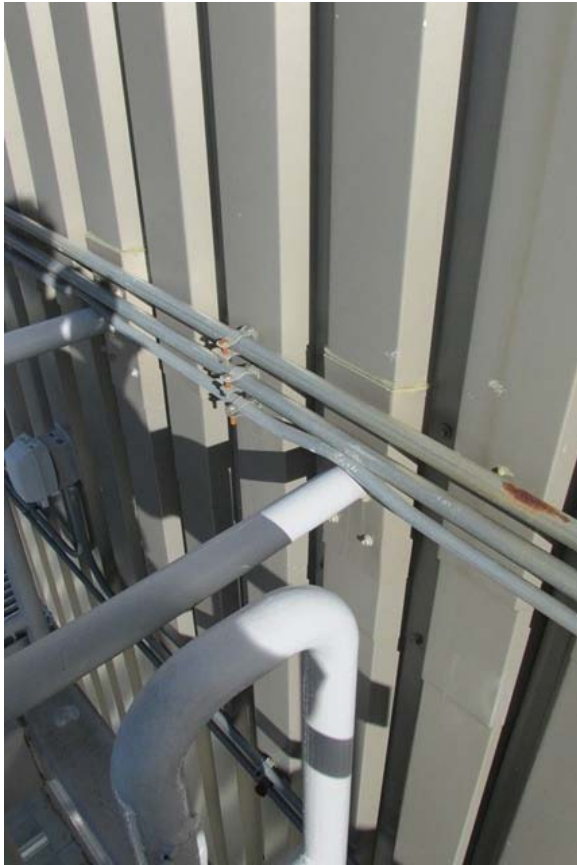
Wall penetrations thru west wall at Mech. Mezz.
